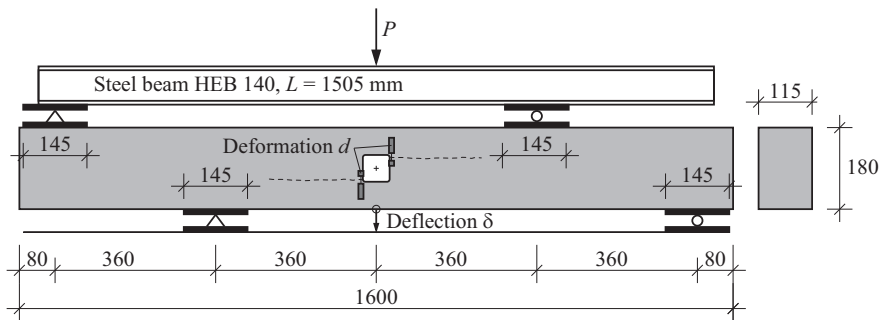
Test setups with dimensions of glulam beams and steel parts.
